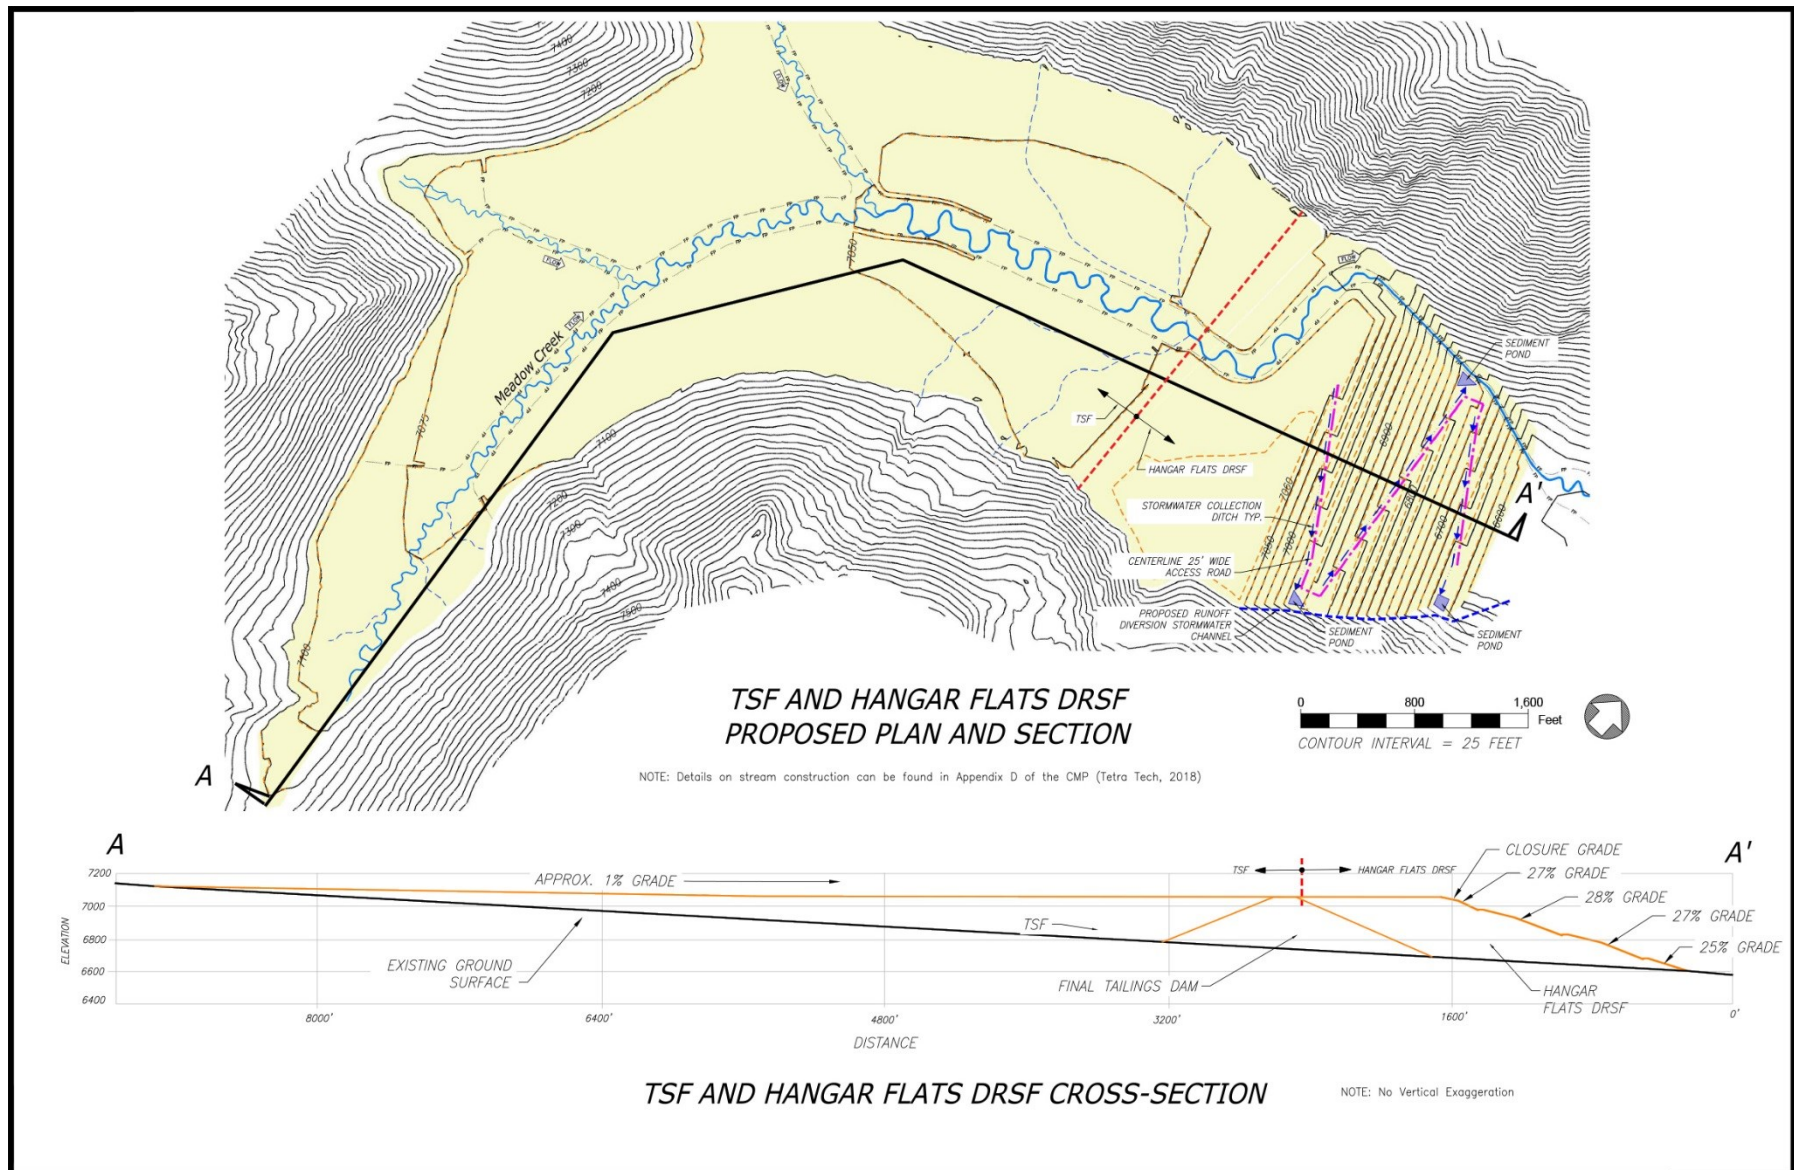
TSF and Hangar Flats DRSF plan and section
